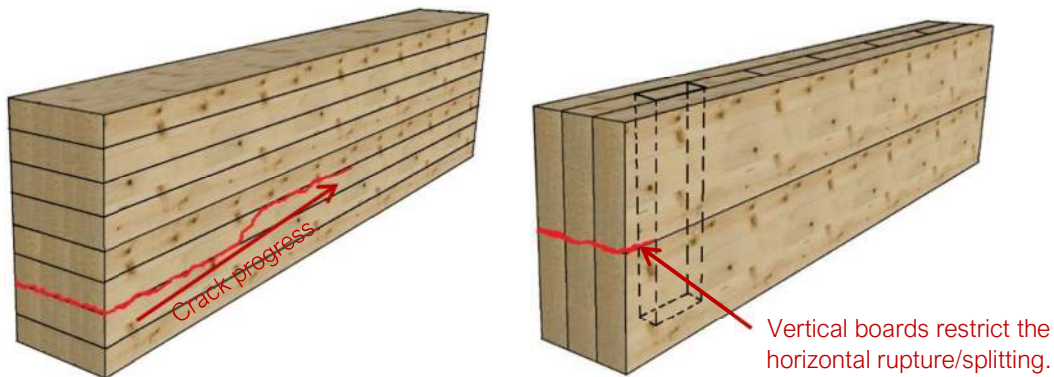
Progressive cracks in beams; a) Traditional GLT beams with continuous progressive rupture; b) CLT beam's perpendicular lamella restrict the rupture from progressing down the span.
